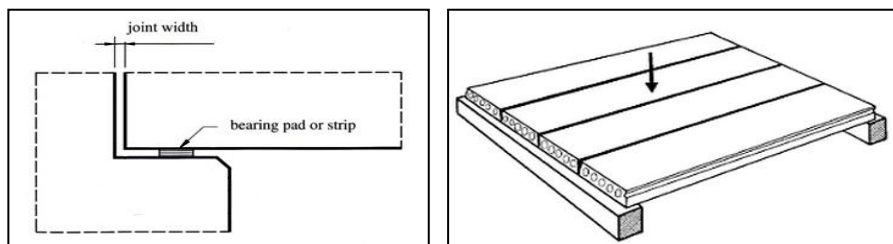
Illustration of a simply supported beam-to-floor connection (Walraven 2013)
